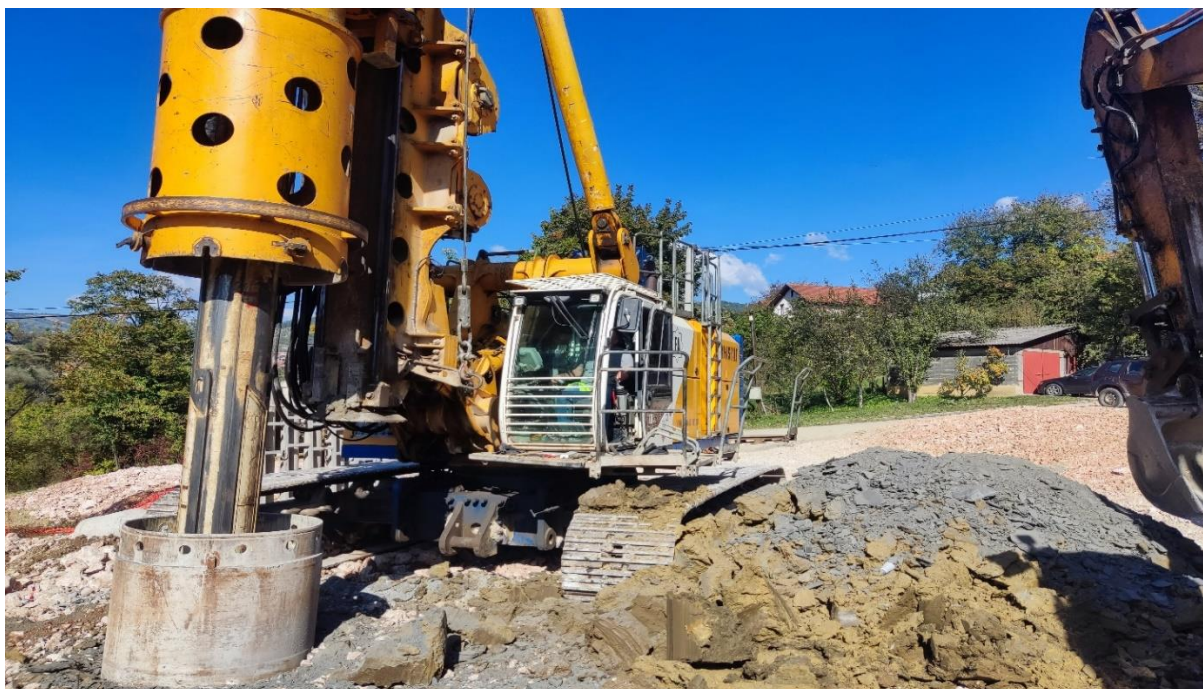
Drilling piles to protect the approach cutting of the exit portal of the Kobilja Glava tunnel (photo by authors)
